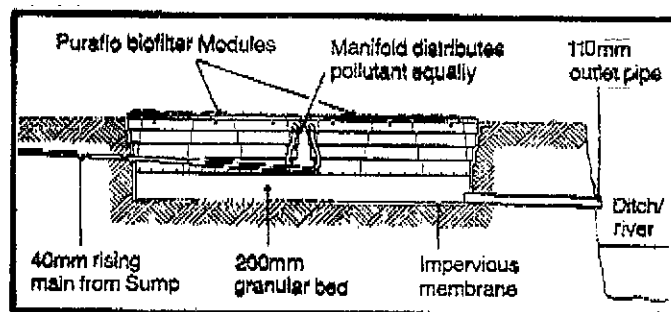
(a) Puraflo system discharging treated effluent into open ditch, stream or river
